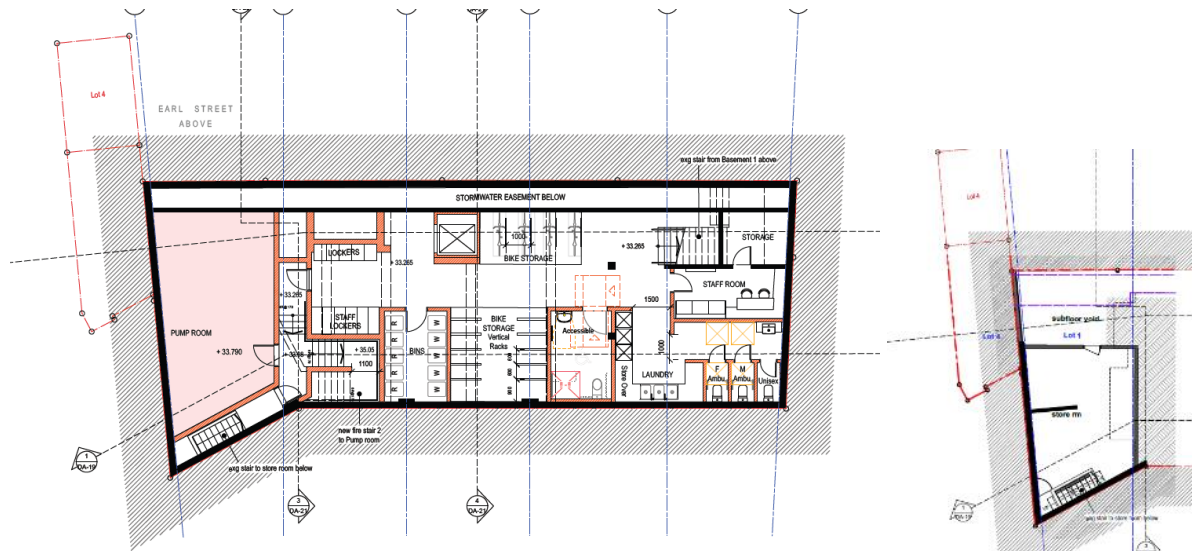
Proposed Basement Level 2 & 3 Floor Plans
